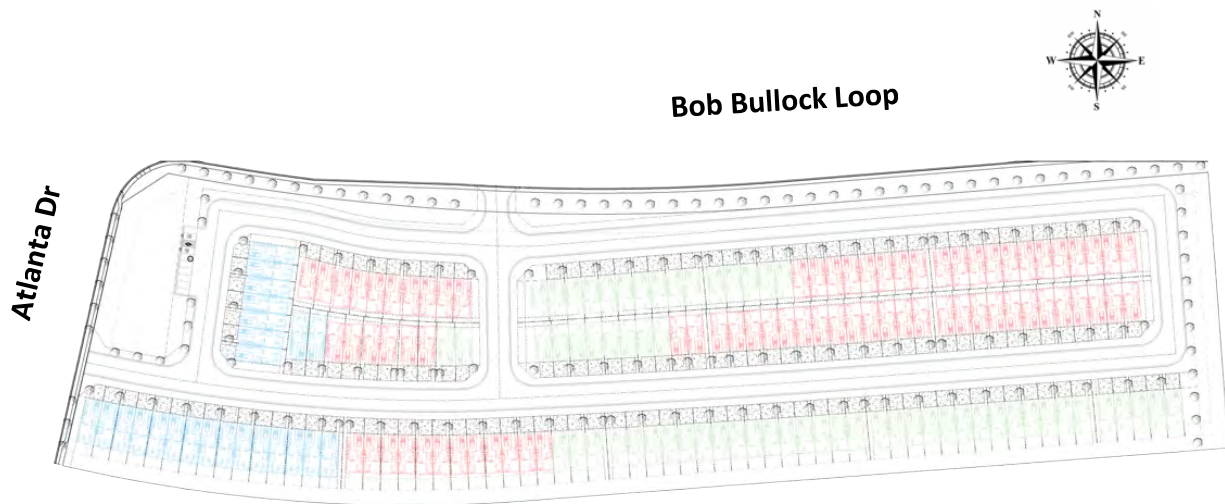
Site Plan for the Proposed Ariva Bridge Crossing Townhomes
